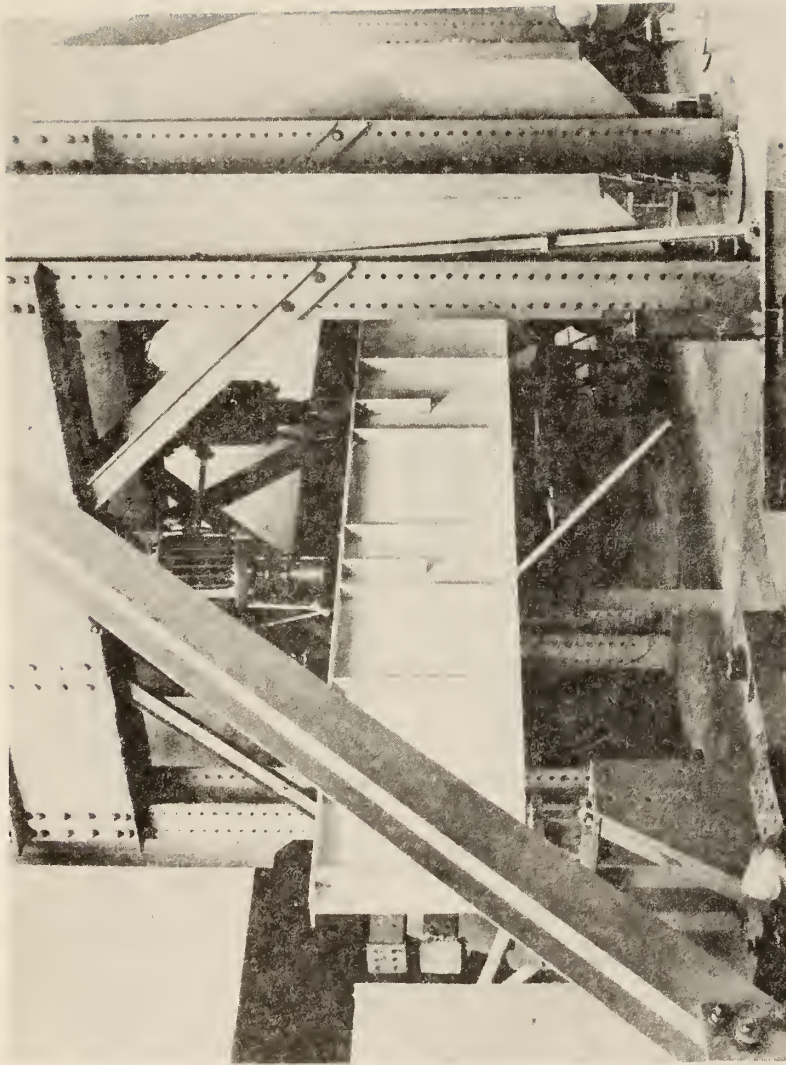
Test setup for "full scale" girders with transverse stiffeners.
